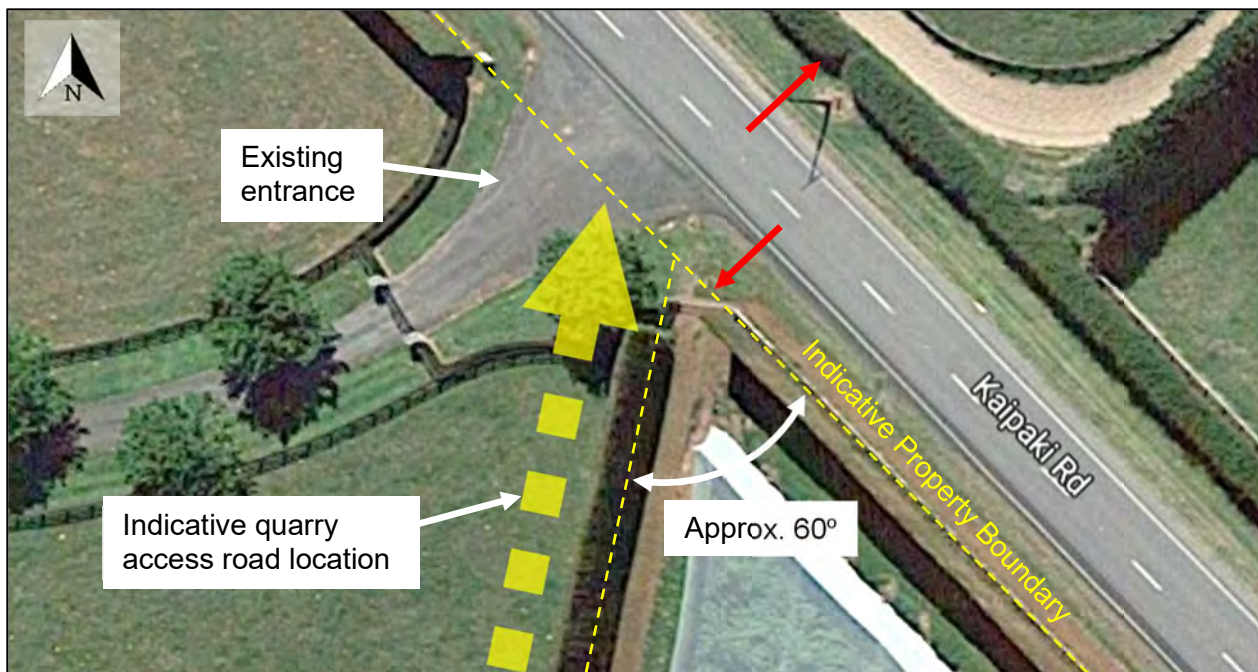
928 Kaipaki Road proposed entrance and access road location showing skew angle (red arrows indicate existing property gates)
